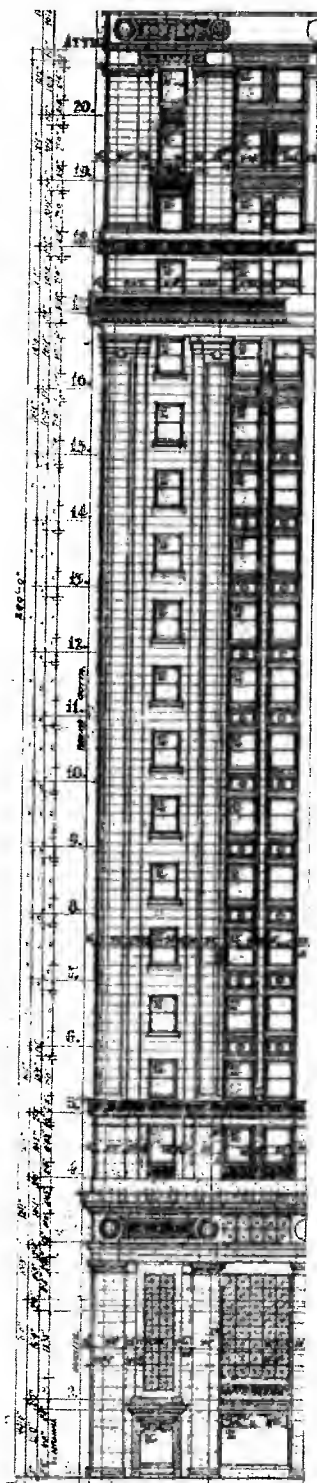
1913 Drawing of the south corner section of the Adams Street façade of the Continental & Commercial National Bank Building
